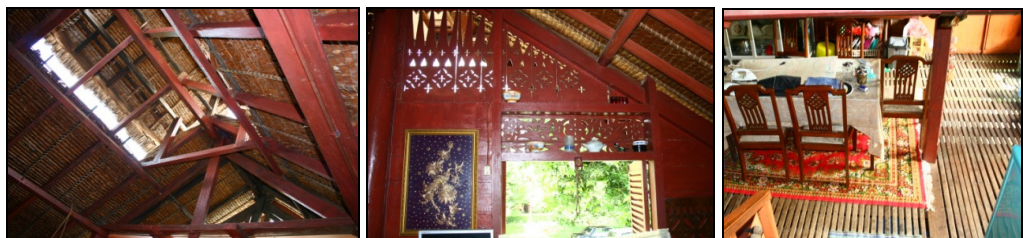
Openings (apertures) throughout the building envelopes (Taqiuddin, 2009)
